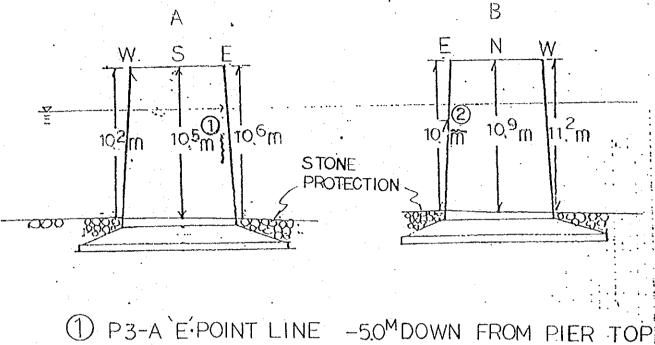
Location of Cracks at Pier No.5
